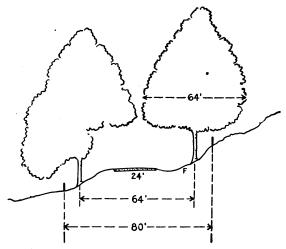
An 80-foot right-of-way with a 24-foot improved roadbed. The trees are placed 32 feet from the center line and the footpath (F) is placed inside the row of trees.
